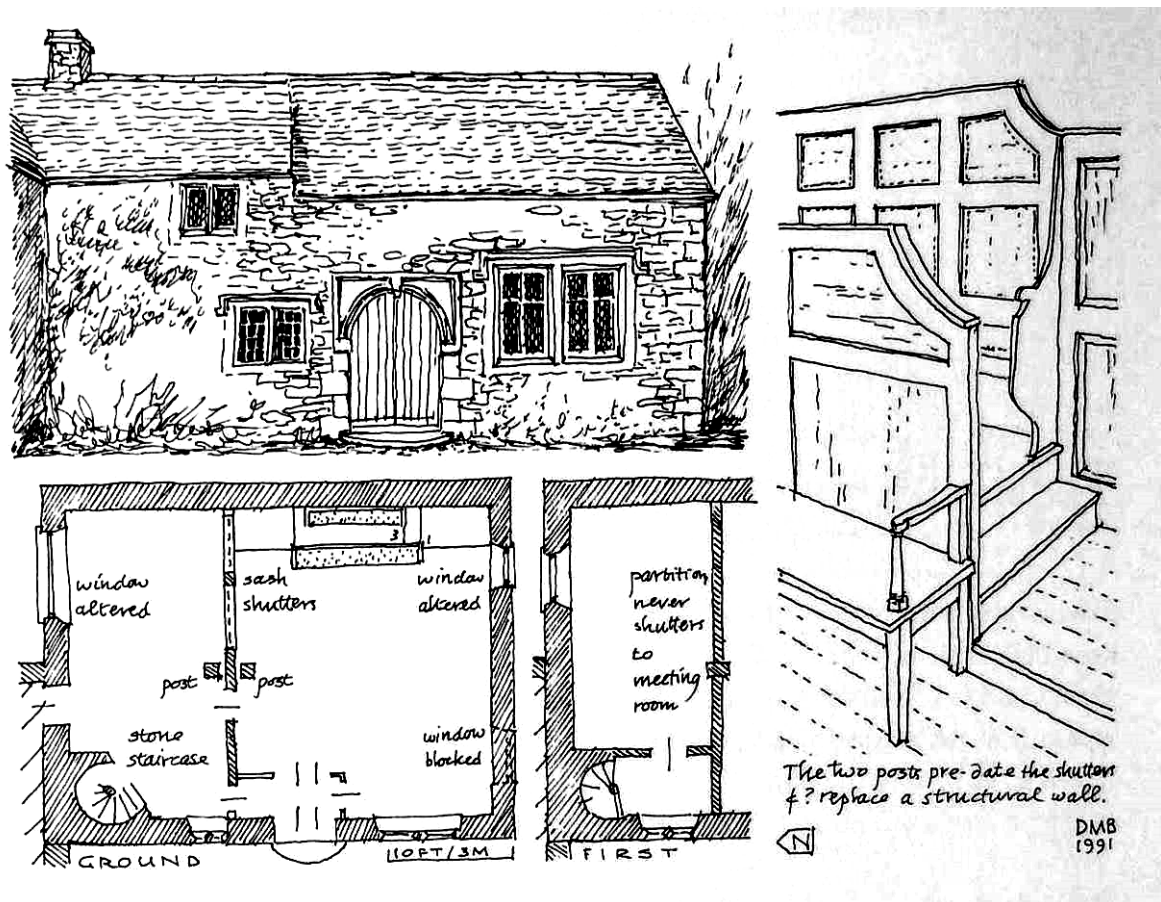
Plan, elevation and detail, from Butler, vol.1, p. 220
